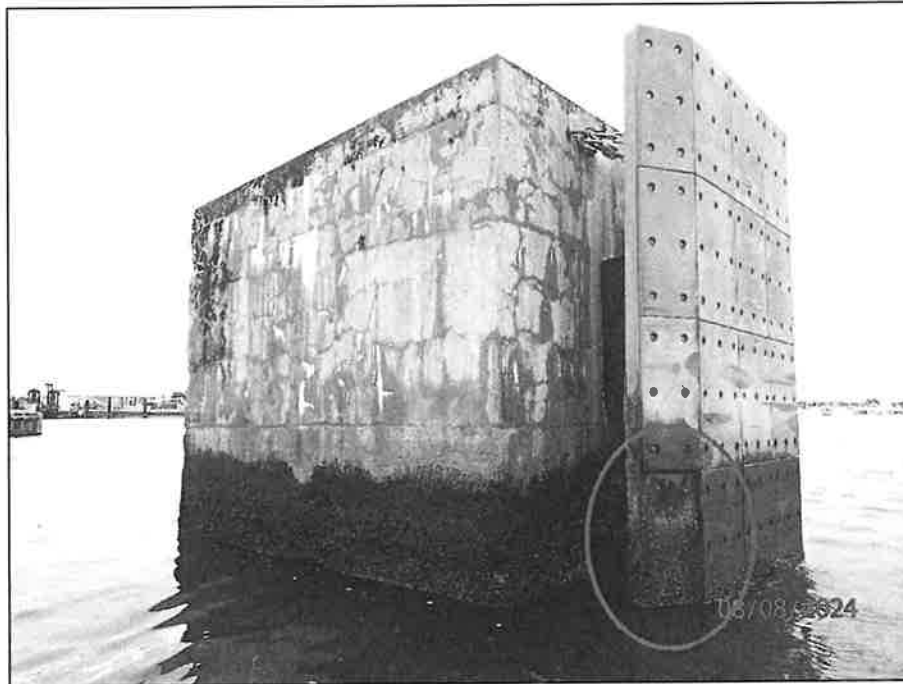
Missing facing plate on Northeast Fender Dolphin
